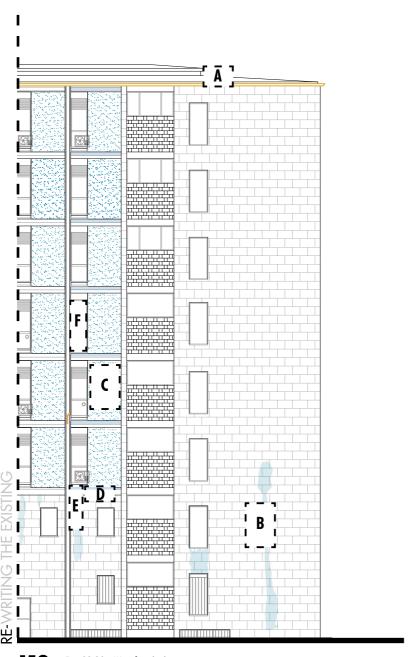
Partial sections and elevation indicating demolitions and additions
